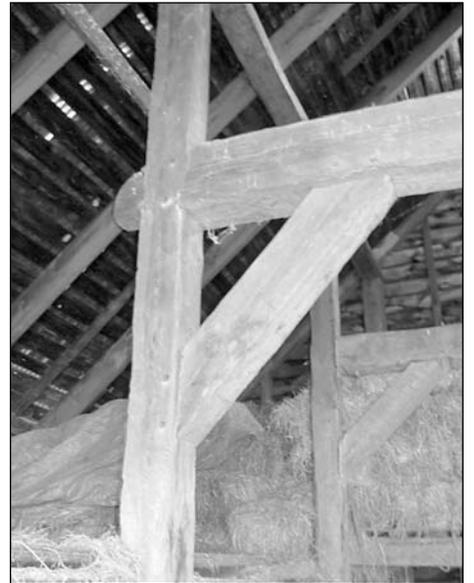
Detail of typical anchor beam end (Ned Pratt, October 2006).
